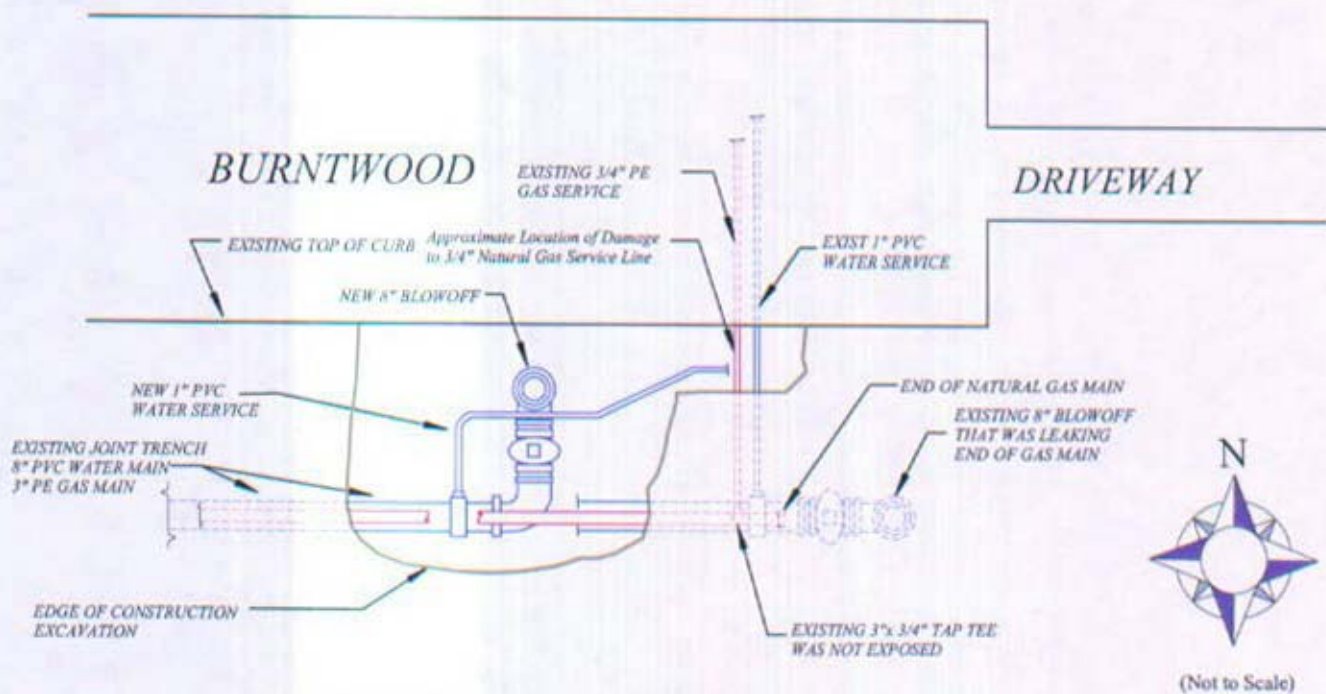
B (Top View of Excavation in Front of 1904 E. Burntwood Street)
